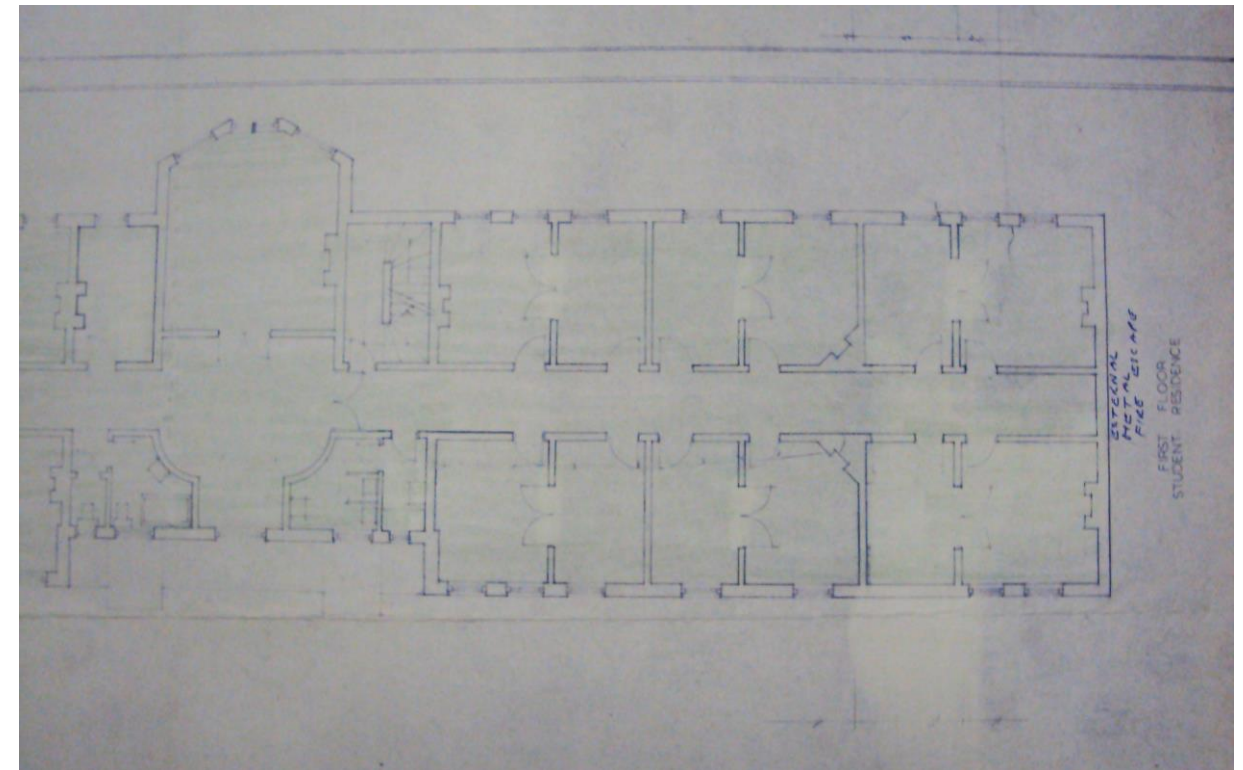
Part of a first floor plan dating from 1970 showing the layout of the accommodation.
